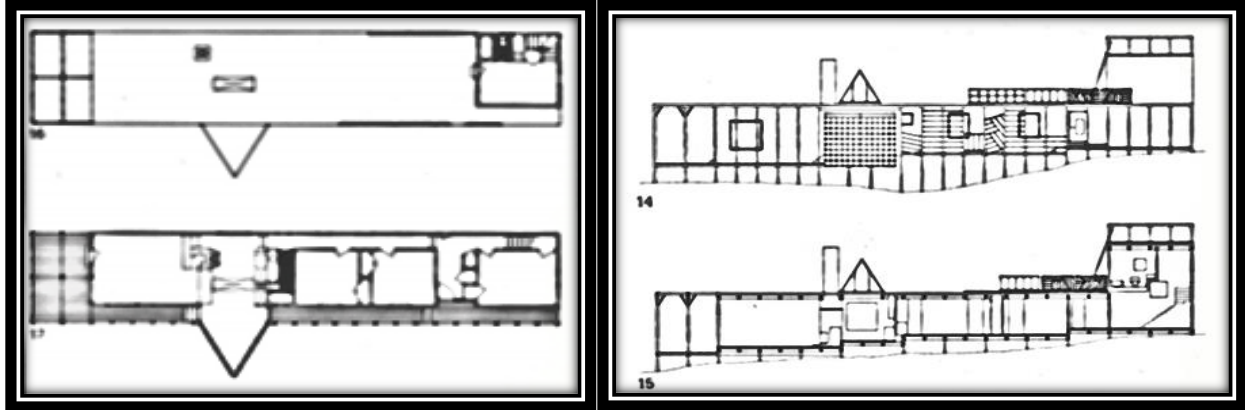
i. Upper level plan, ii. Ground floor plan; Figure 10: i. Main elevation, ii. Section,
